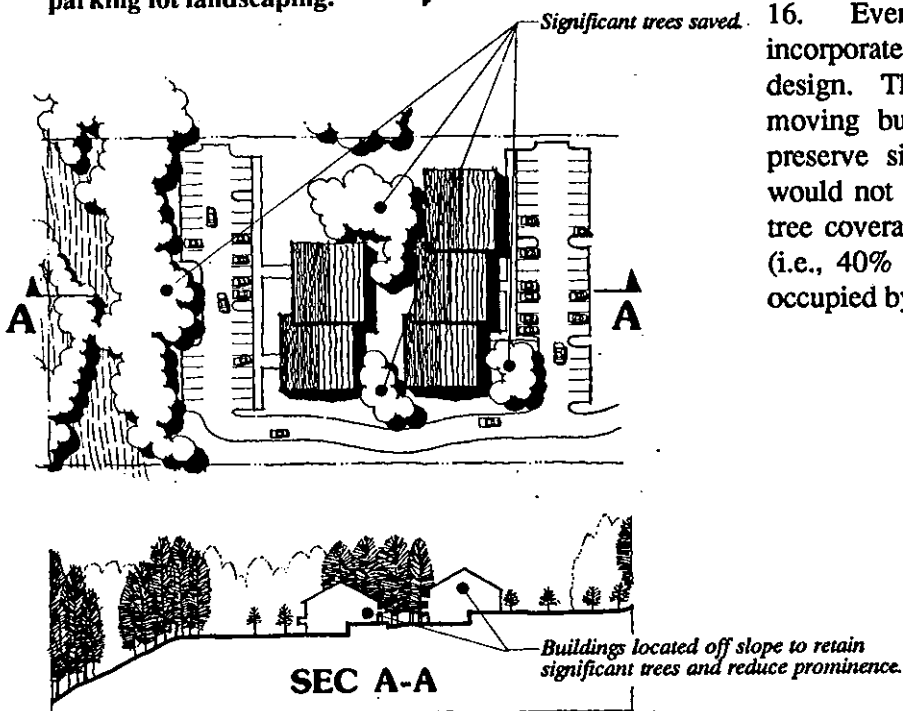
Significant trees are retained through building siting and use of required interior parking lot landscaping.
